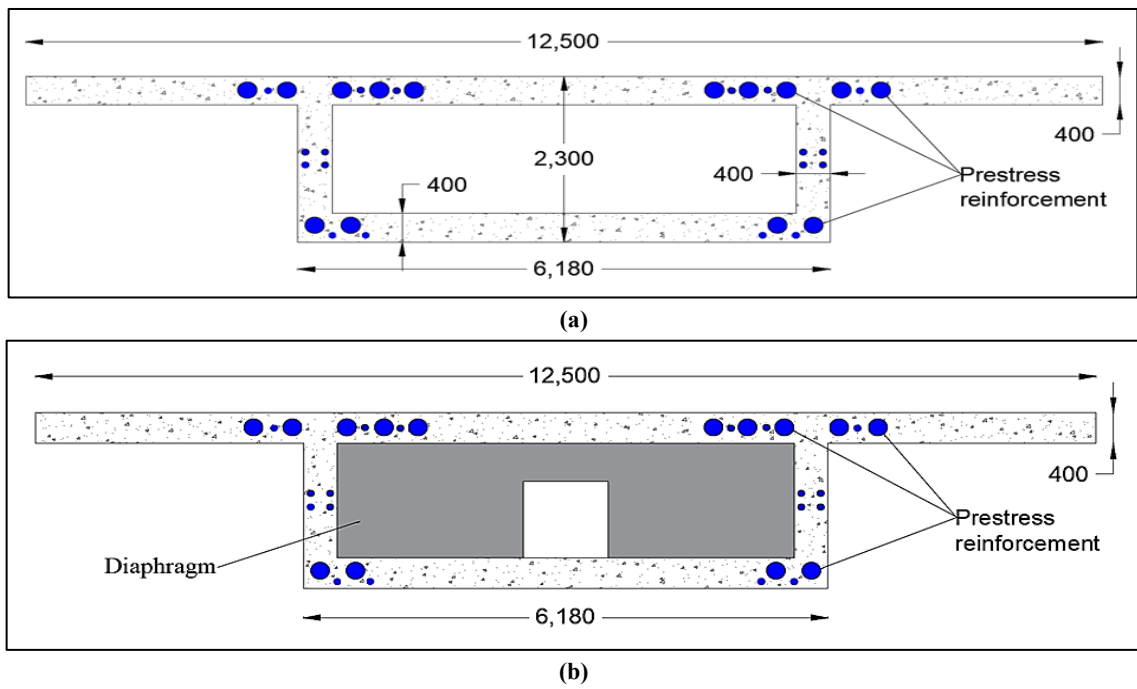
Cross-section dimensions of the box girders in mm (a) at midspan (b) at support
